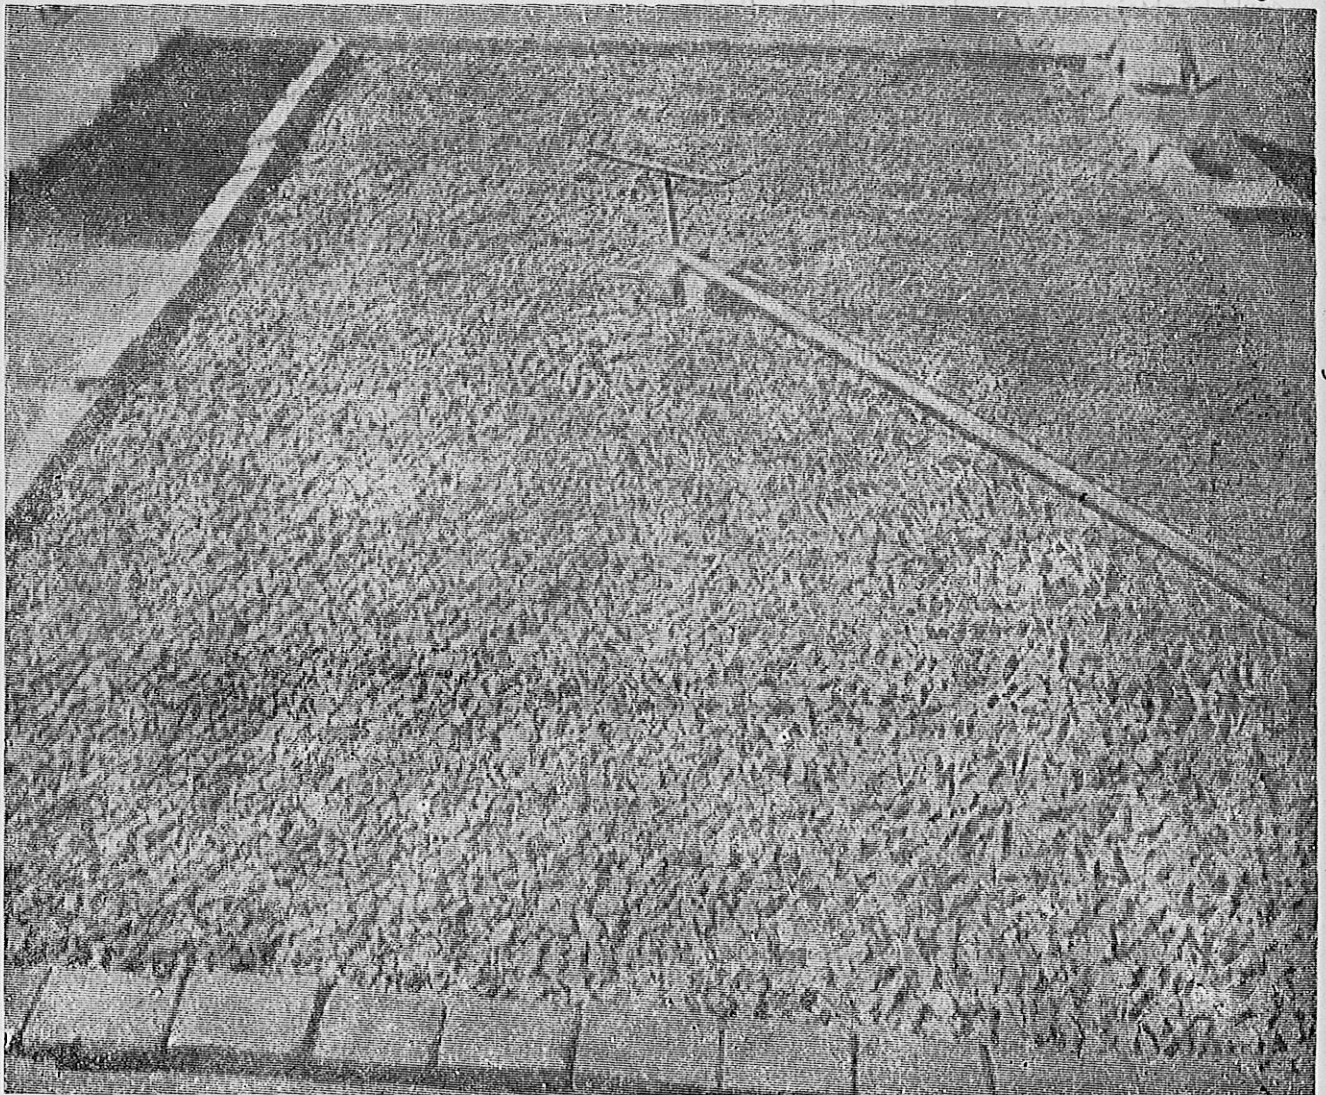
Roof of a Room Treated with Brick-Ballast & P.V.C. Sprayer
